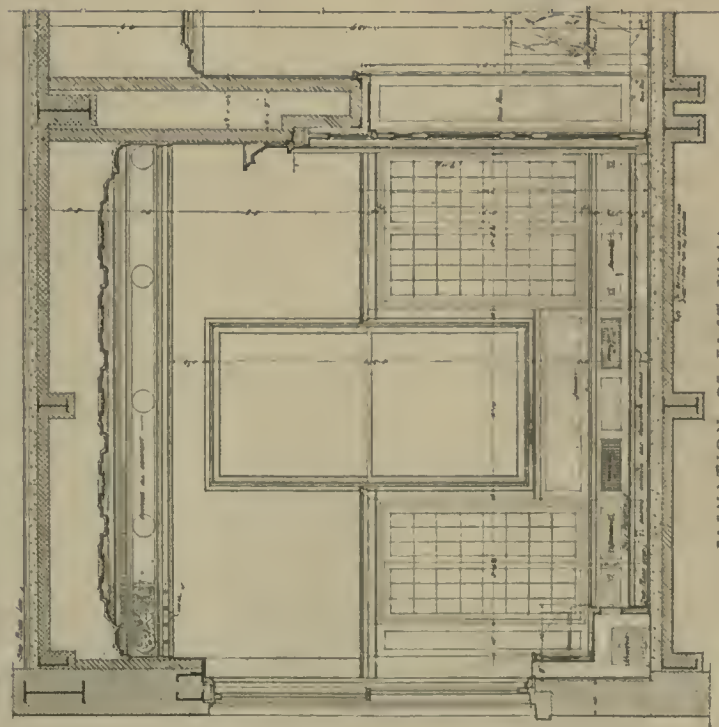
DETAILS OF VESTIBULE AND ENTRANCE STAIR HALL
